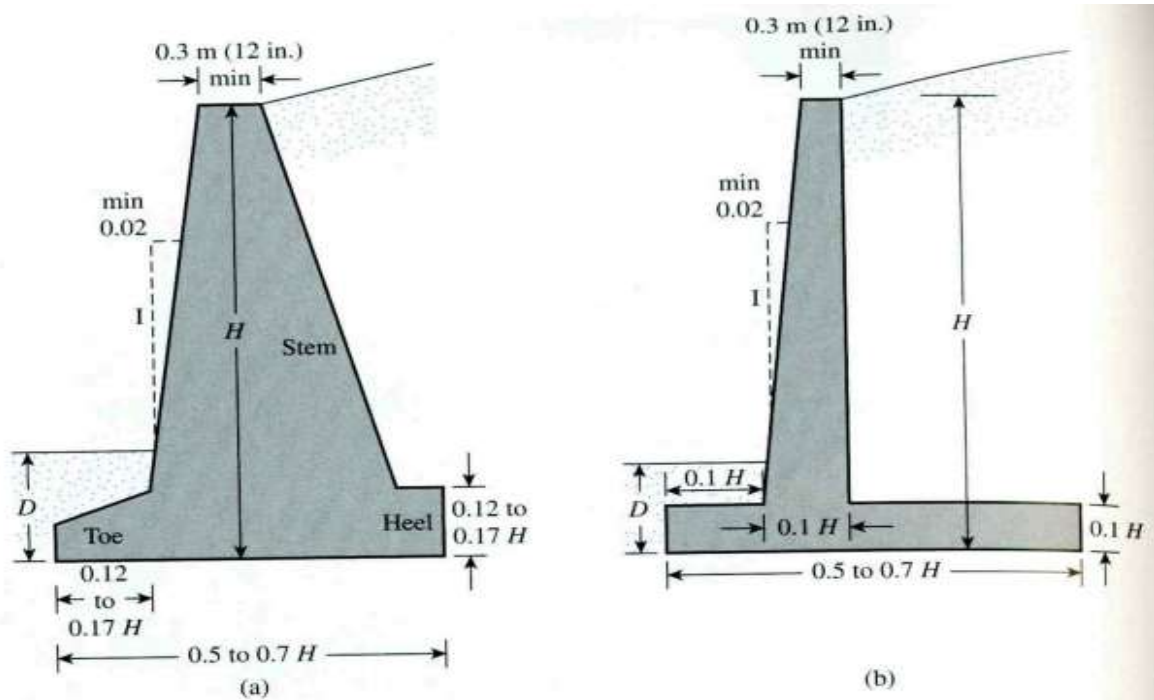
Approximate dimensions for various components of retaining wall for initial stability checks: a) Gravity wall; b) Cantilever wall
